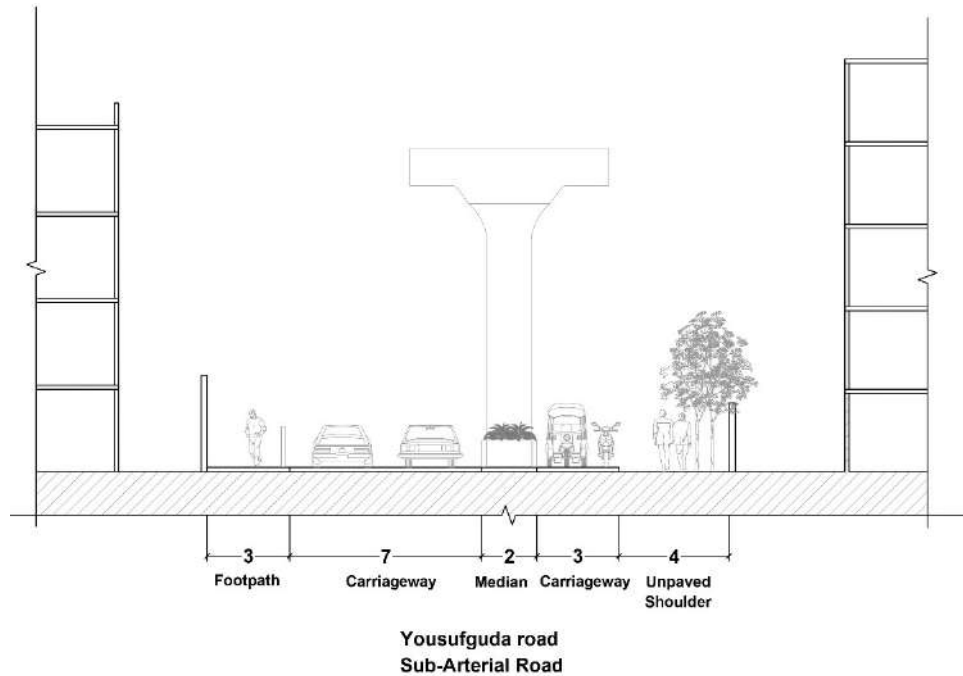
Cross section of Yousufguda Road near Sri Chaitanya IIT Campus (B - B')
